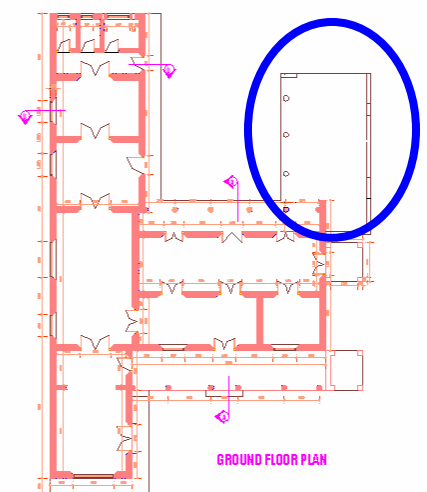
The old destroyed unit to be rebuilt as a garage for cars.
